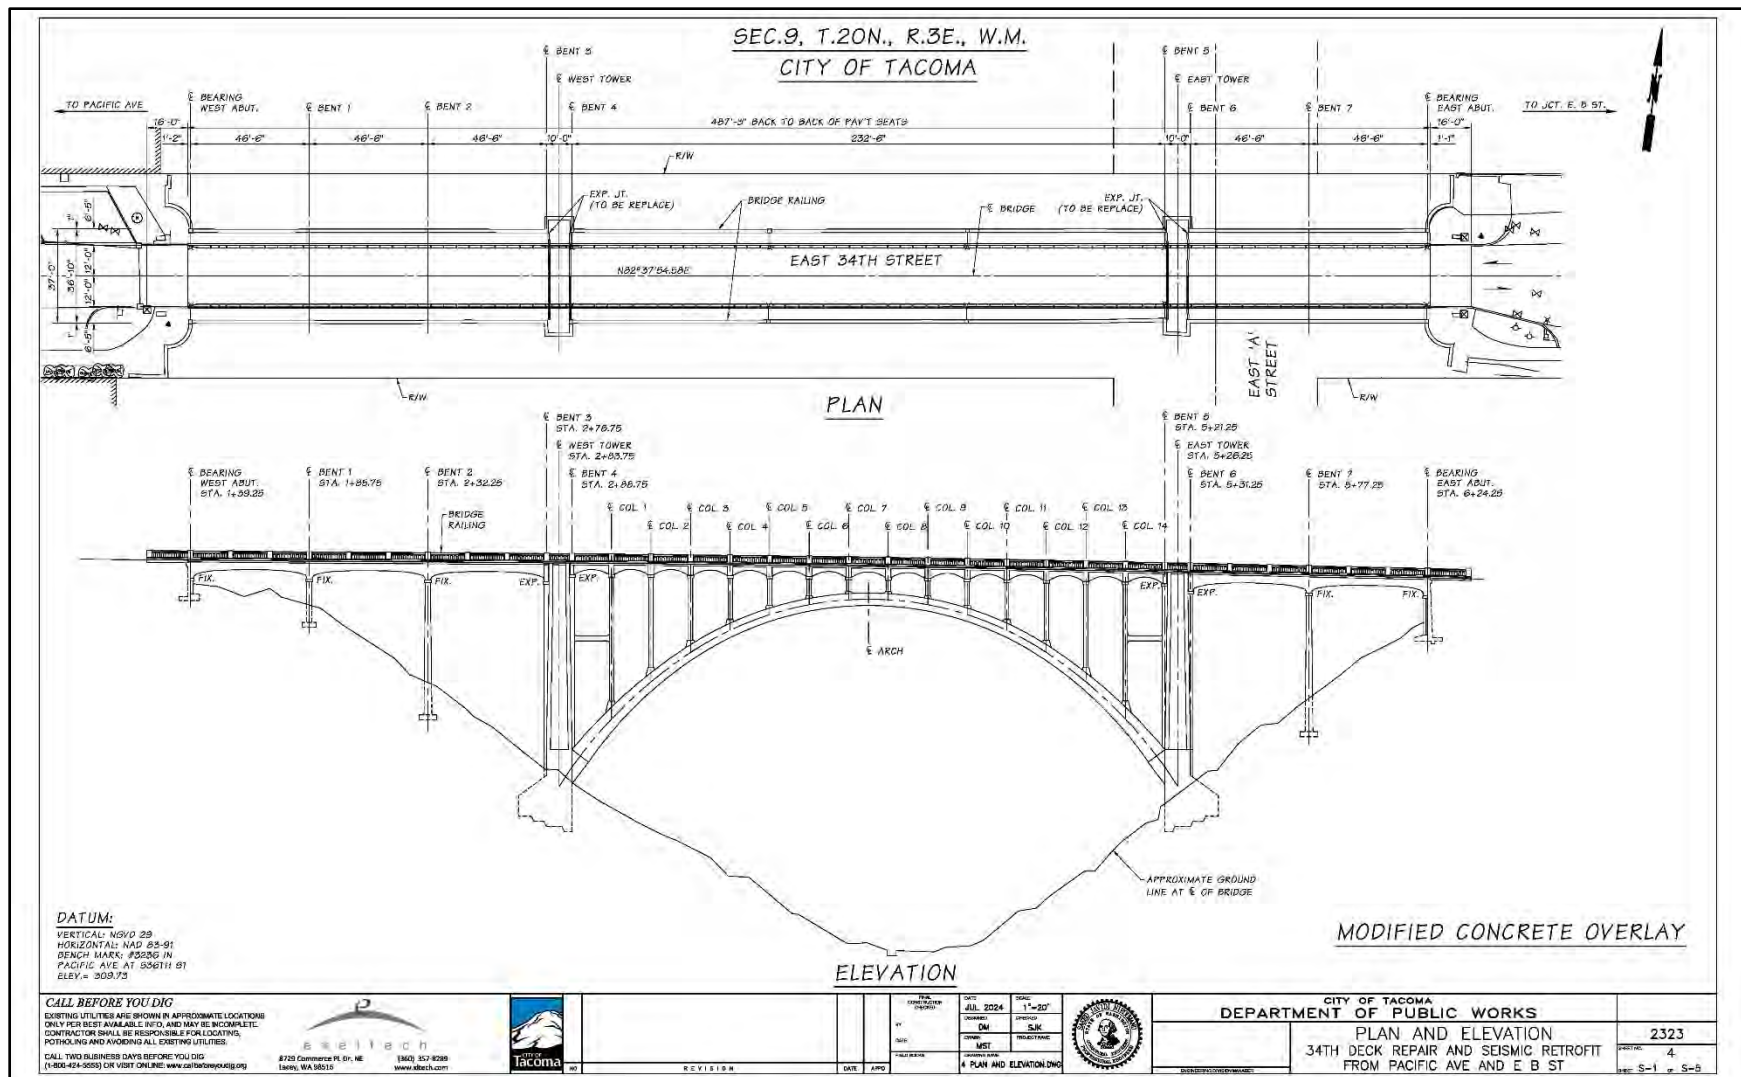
Project plans for the East 34th Street Bridge deck repair and seismic retrofit (as provided by the City of Tacoma Department of Public Works).
